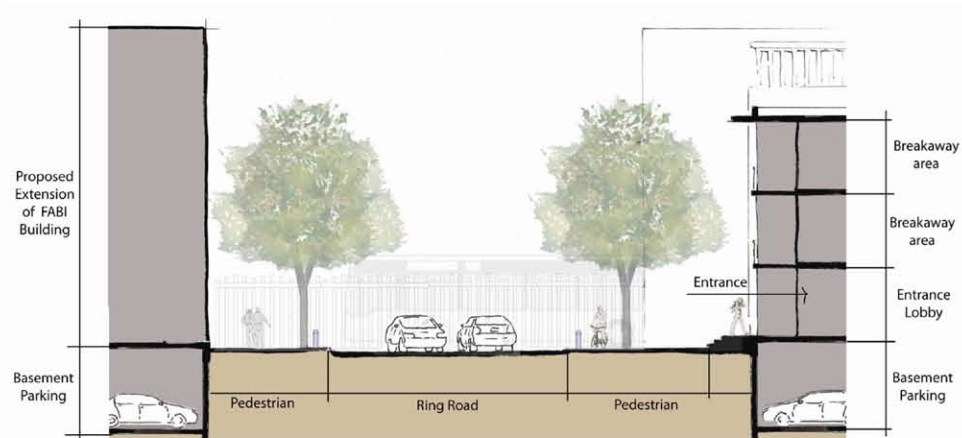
Section through Ring Road illustrating proposed street character on Campus
